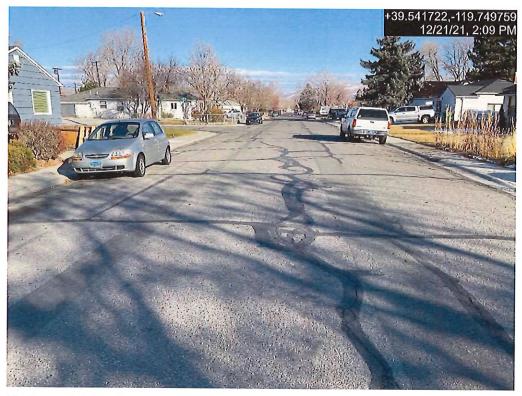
Typical Pavement Condition for G Street from 4th Street to 5th Street
